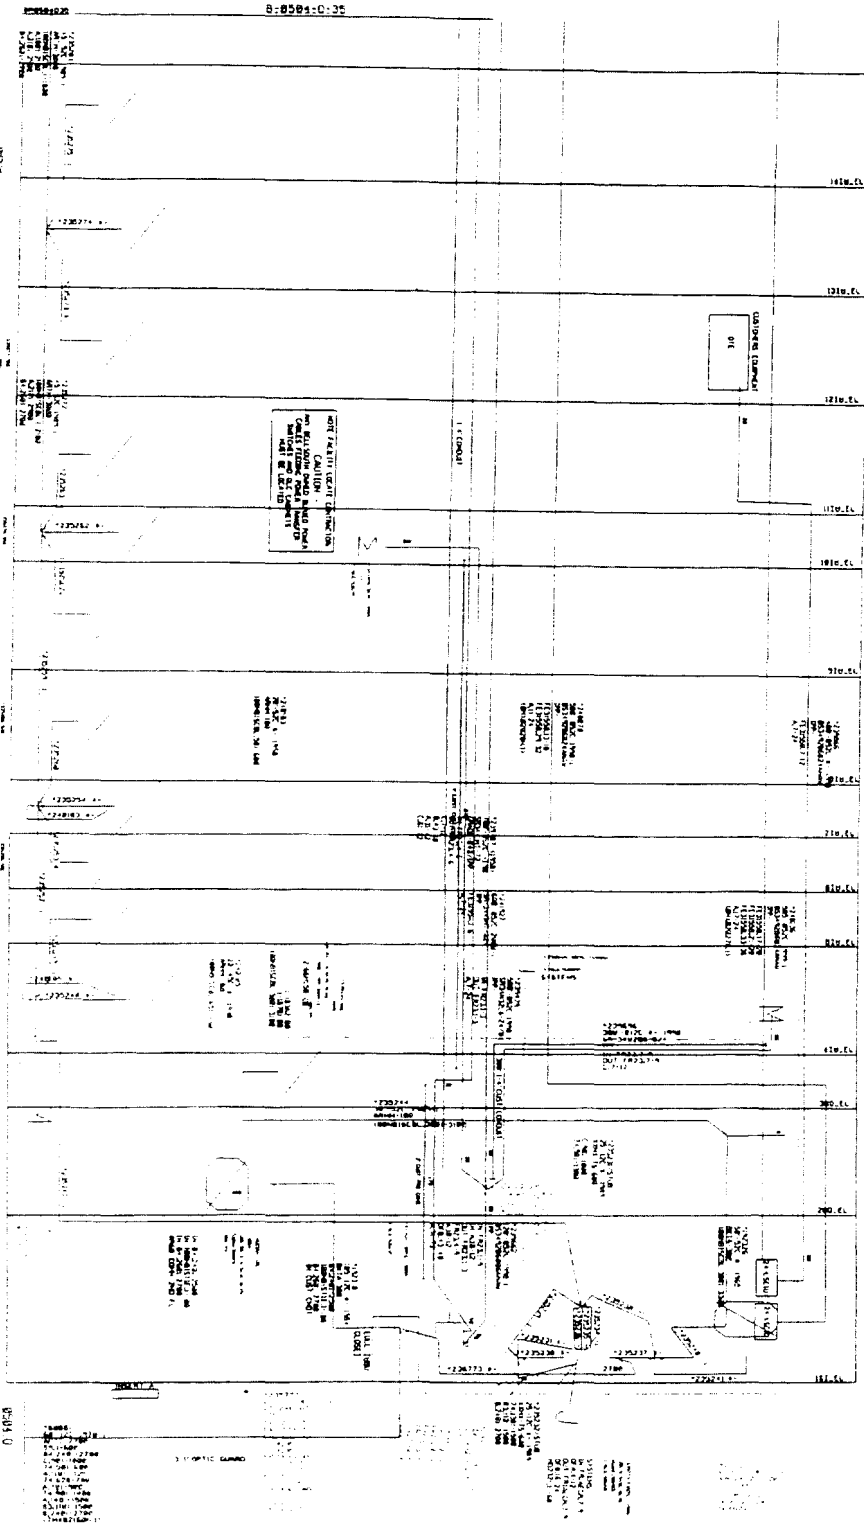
FLOOR ELECTRONICS ROOM
